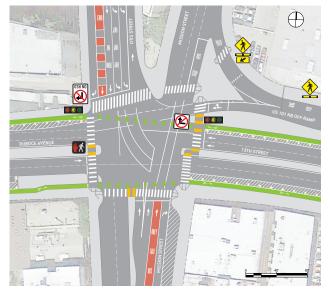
Mission, Otis, Duboce, 13th Street Improvement Plan (Option 1)
